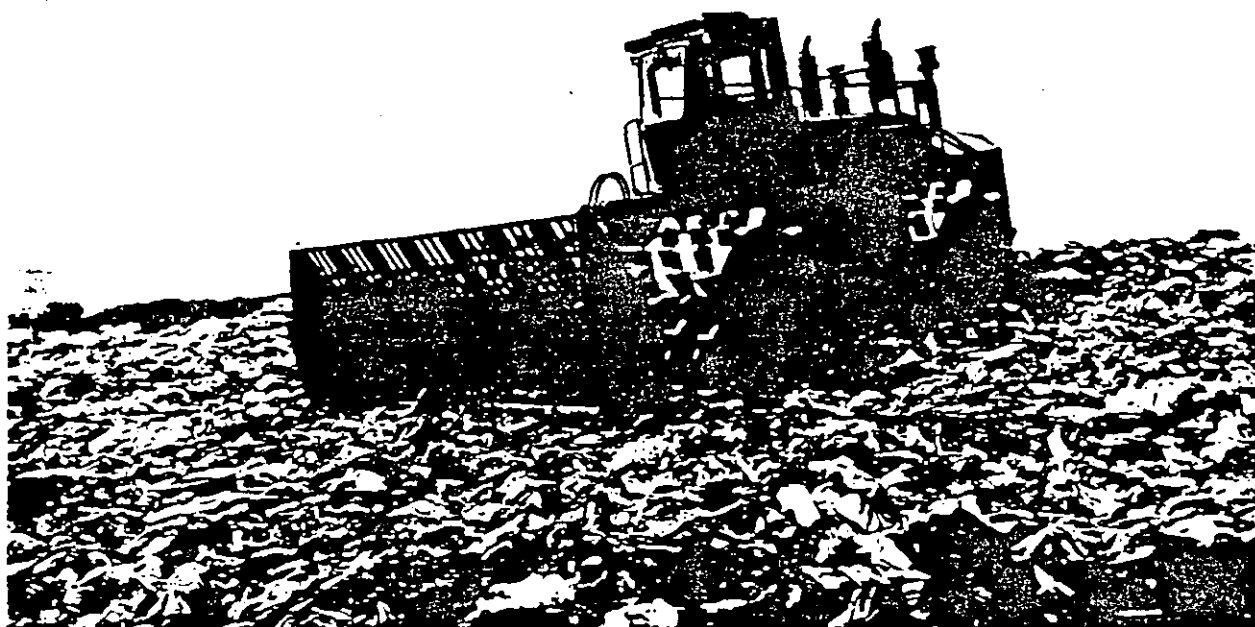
Steel-Wheeled Compactor (Courtesy of Ingersoll-Rand)
